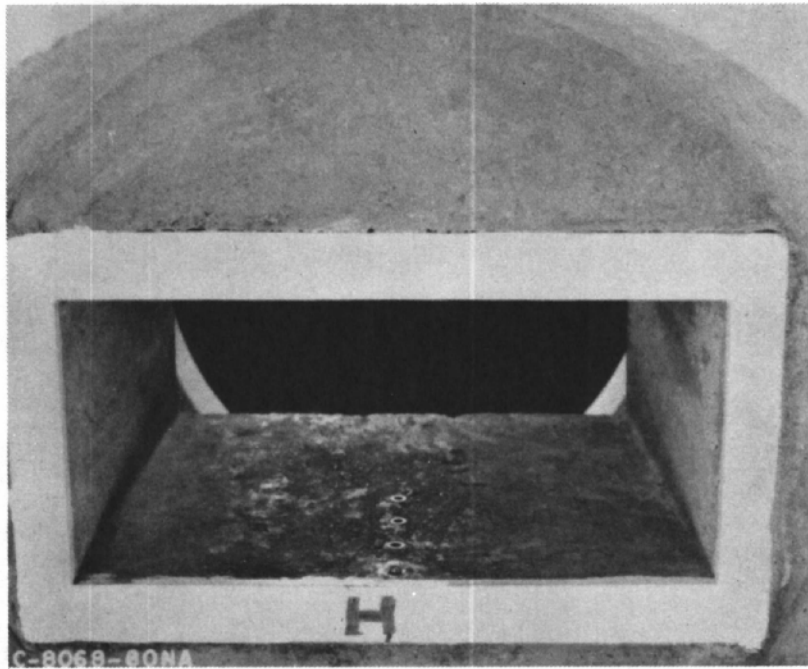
Concrete orifice, 4 by 9 by 8 inches prior to subsection to a continuous 10-feet-per-second flow of 290° F synthetic sea water. Photo PX-D-53637
